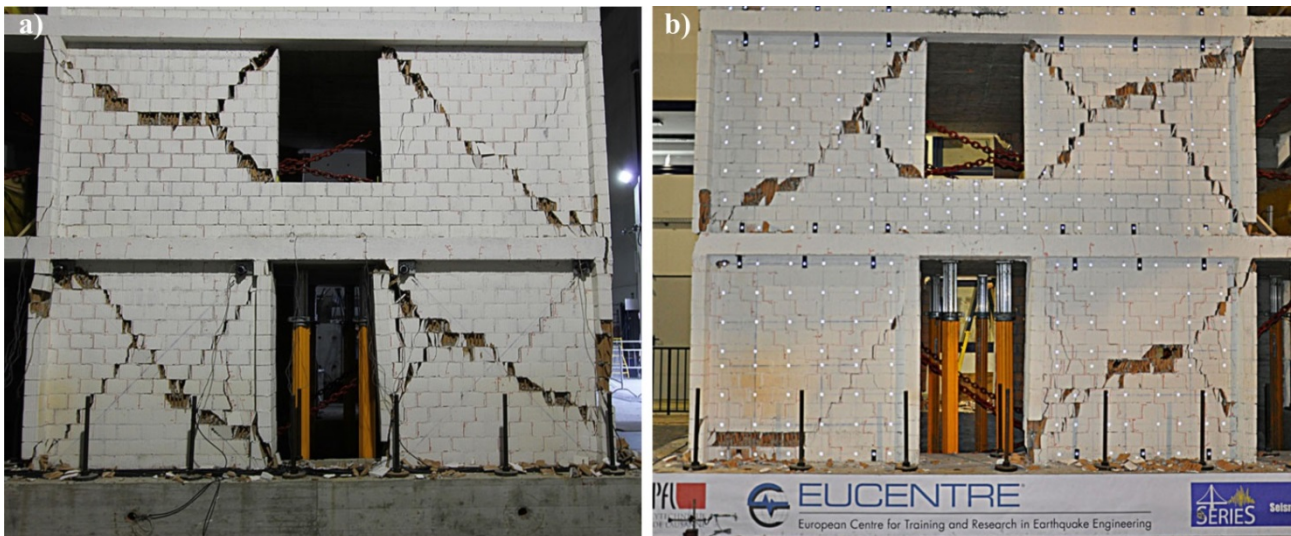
Dynamic test on building with RC and URM walls: Crack pattern of the in-plane loaded URM walls of the two lower storeys after the last test.
